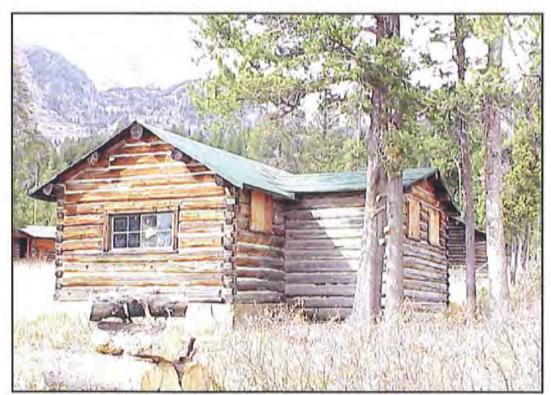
South and east walls of HS-1161, Cabin 11. Source: A&E Architects, 2004.
